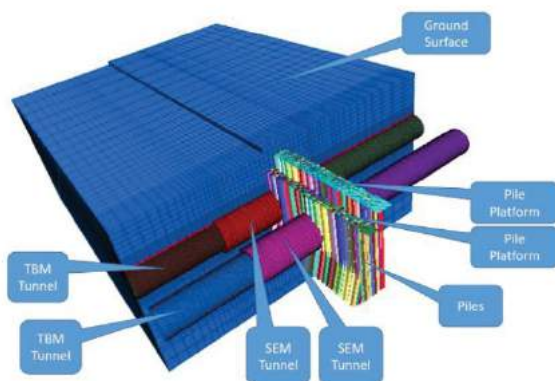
Numerical modeling evaluating the effect of tunneling through existing structures.
